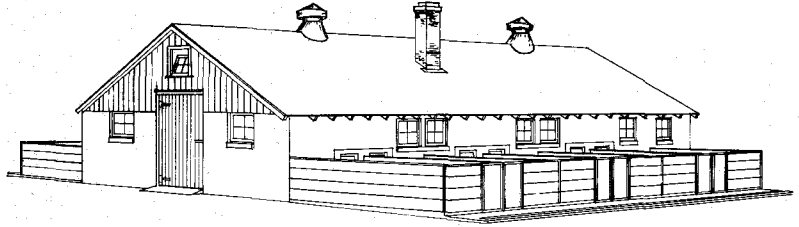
A central hog house showing layout of outside yards for exercise and sunshine, as well as feed-storage facilities at the end. Note location of water devices, guard rails, and gutter drains.
